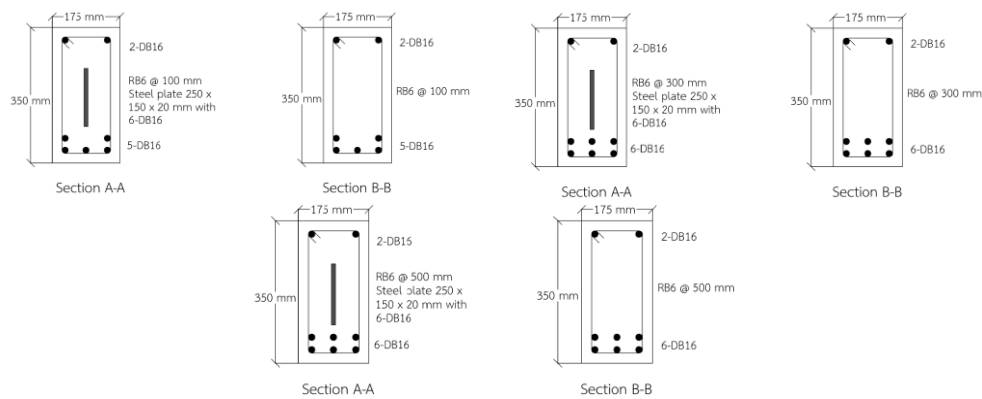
Cross-section of the beam specimen without deformed bars welded to steel plate: Group 1 to 3.
